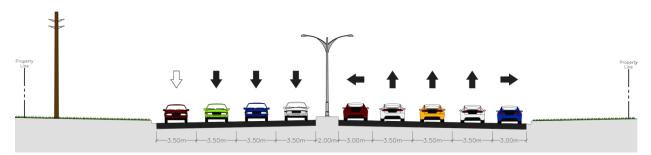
Preferred Design, Highbury Avenue North Cross-Section, South of Hamilton Road
